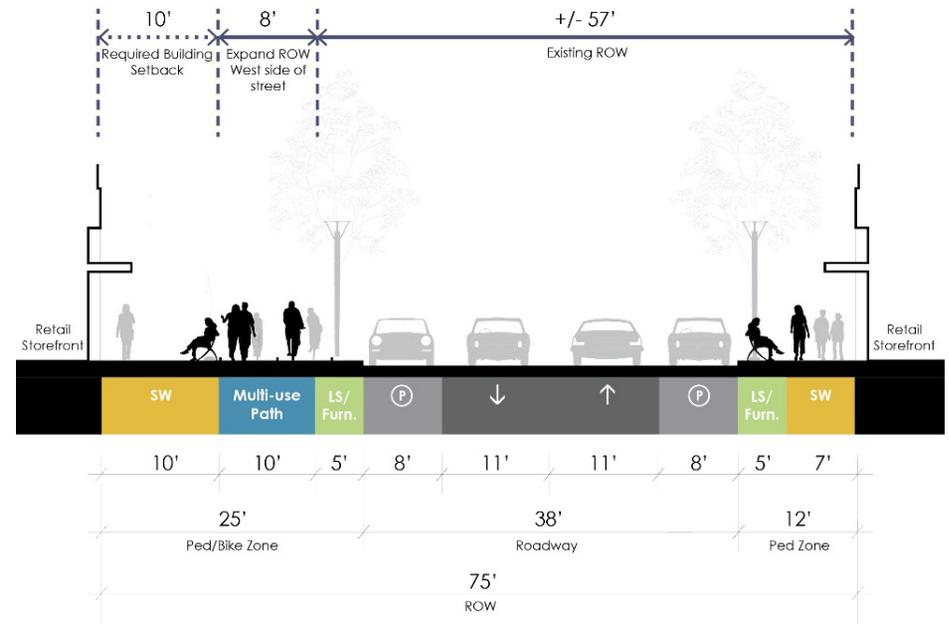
Retail Street Illustration (Main Street View Looking Northwest Between 17th Pl. NE and 18th St. NE)
